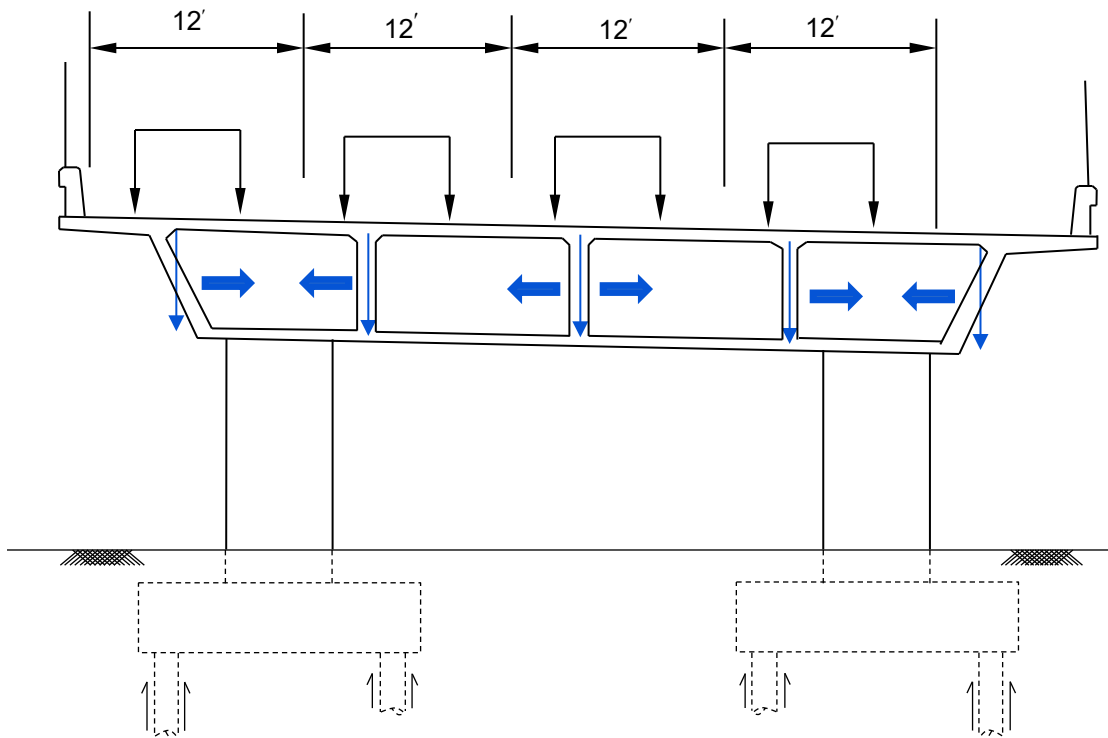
Truck Load Path from Bent Cap to Columns
